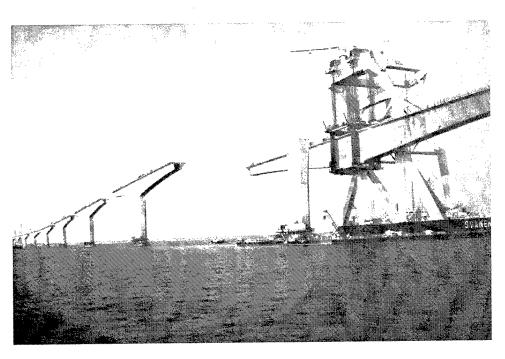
The Svanen lifts a 7,000-ton bridge girder segment
